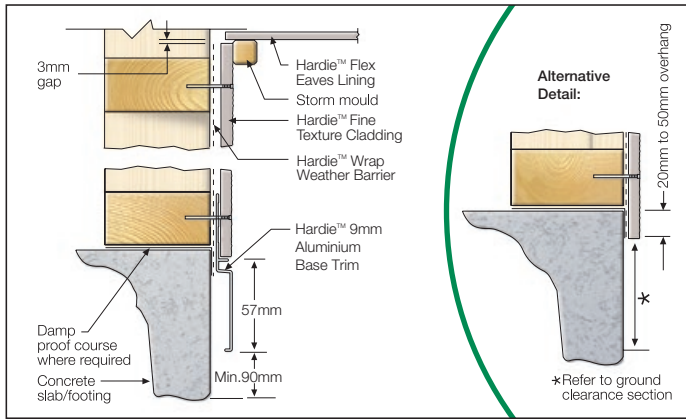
SLAB/EAVE JUNCTION DETAIL
